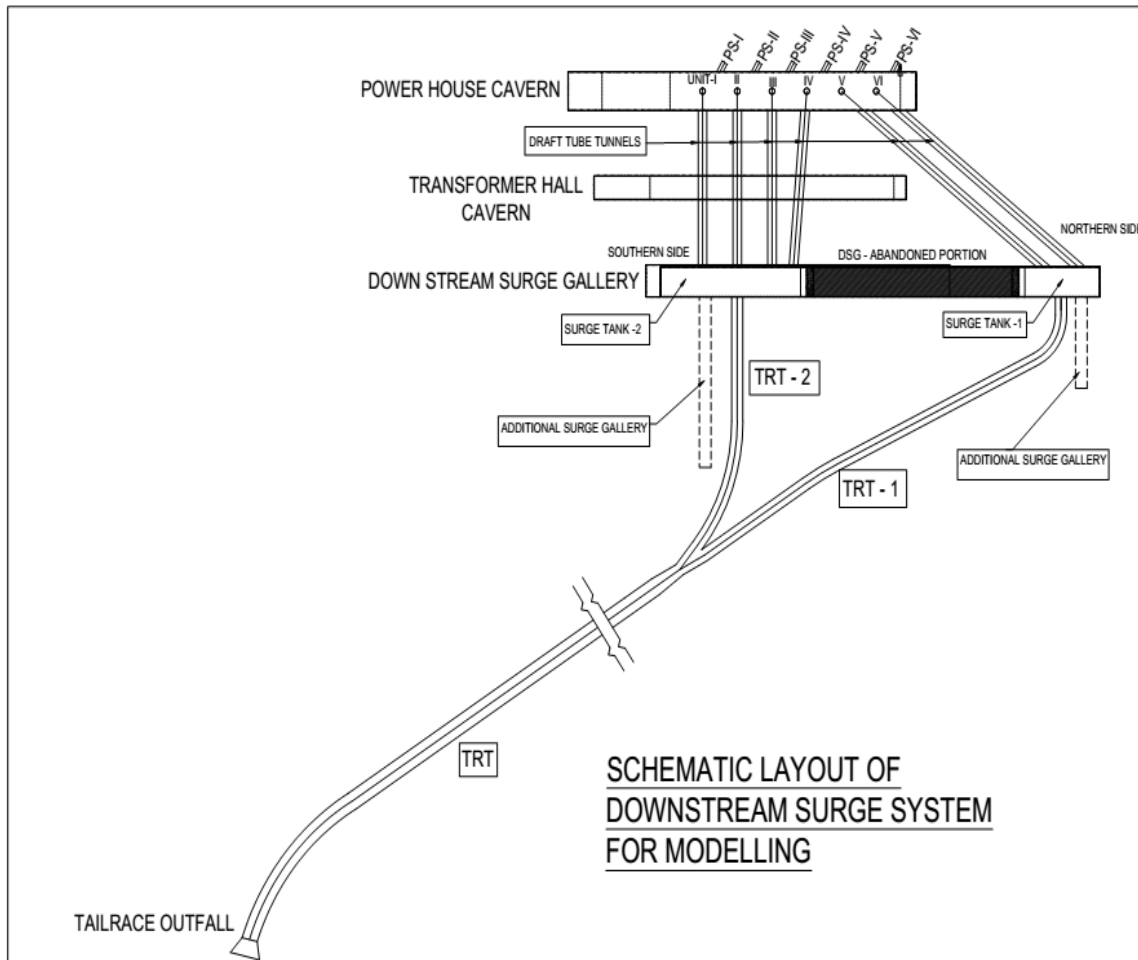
Schematic Layout of Power House Complex showing Additional Expansion Galleries
